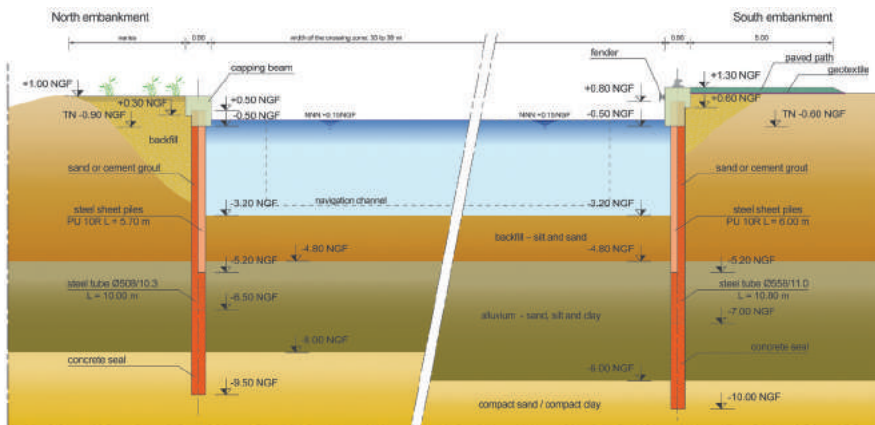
Typical cross section of the new canal crossing zone ‘Aresquiers’, Sete, France
